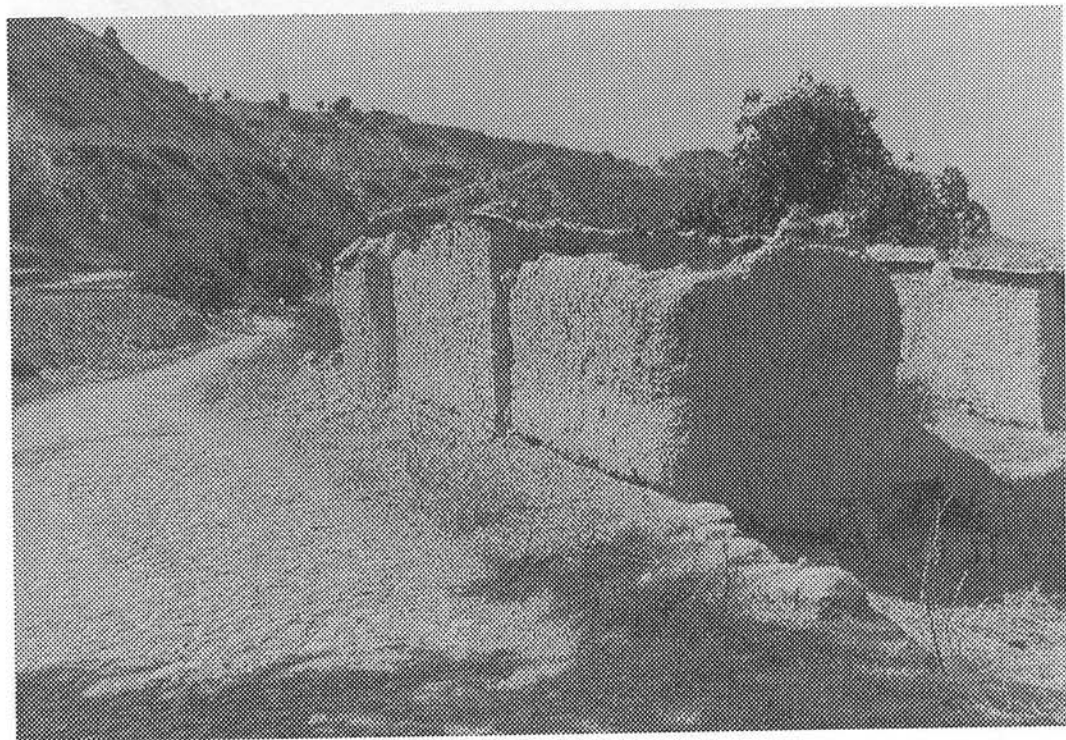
Detail of mud brick wall being undermined by damp and salt deposition at the junction of the brick and stone footing.
